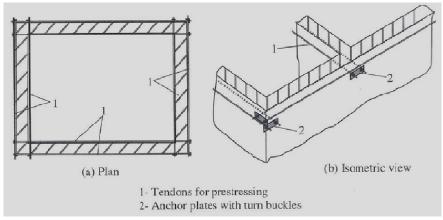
Retrofitting of Masonry Building by Pre-stressing
